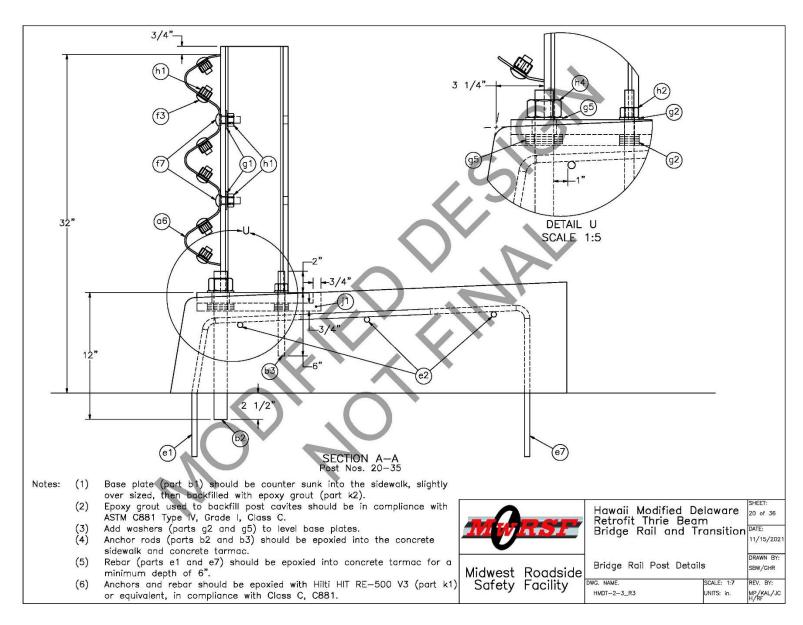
Bridge Rail Post Details, Test Nos. HMDT-2 and HMDT-3
